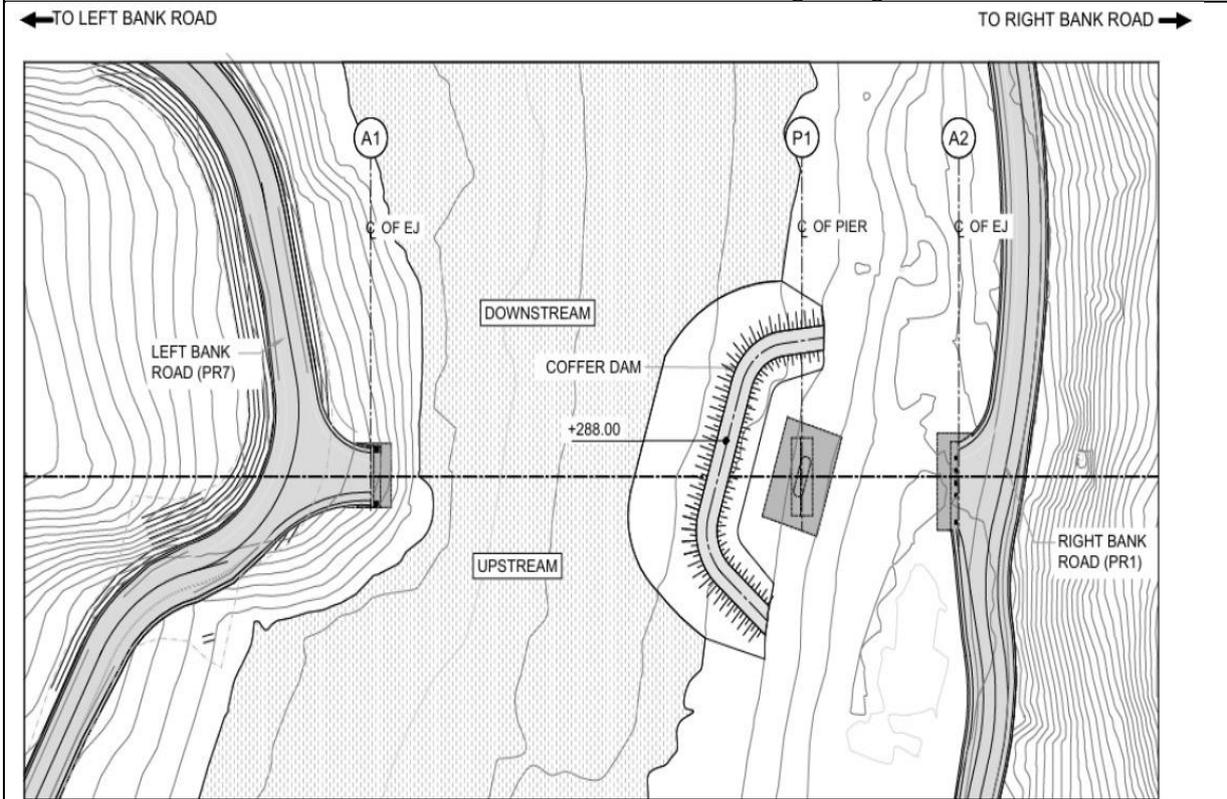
Plan of Cofferdam for Dibang Bridge Pier
